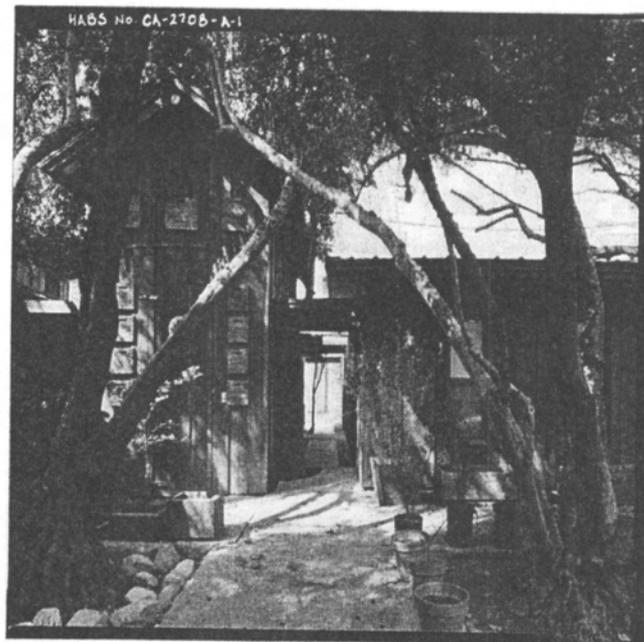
Workshop 1 (left) and Workshop 2 (right), exterior, view west of east elevations (HABS)
